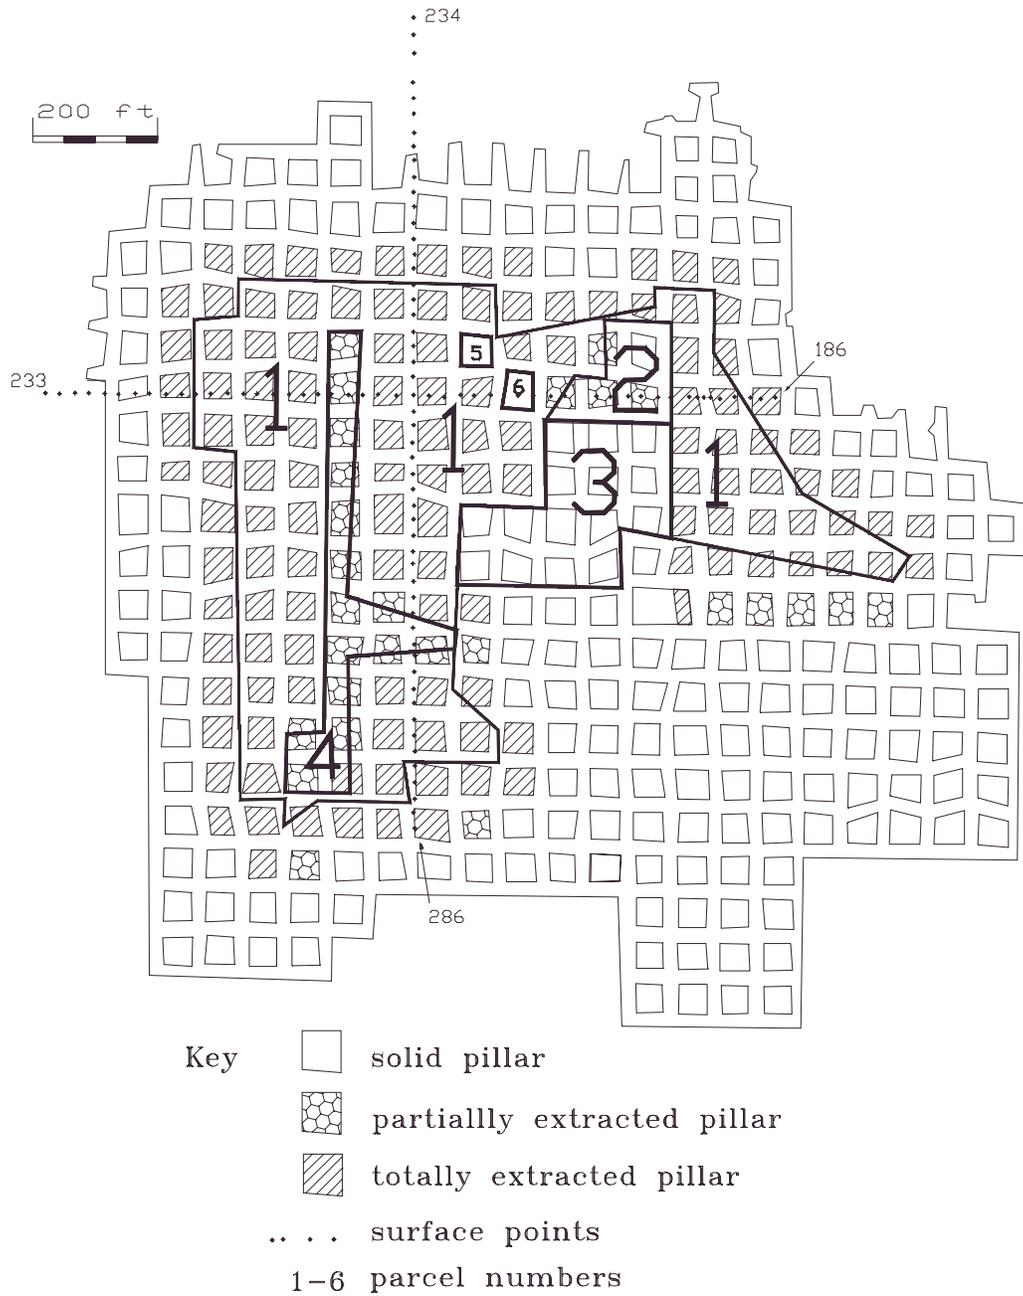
Mine Plan and Parcel Layout, Example #14
